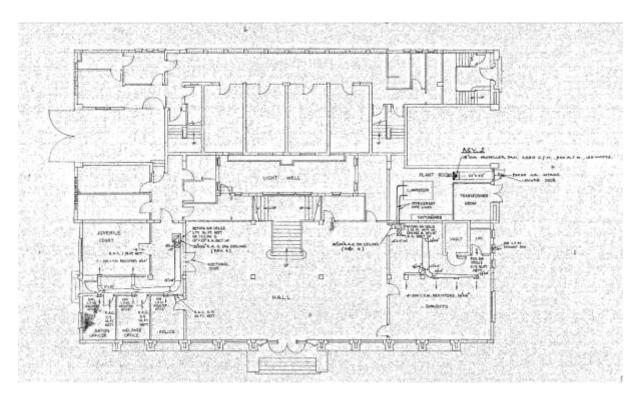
Ground Floor Plan with BS installation (1959)
